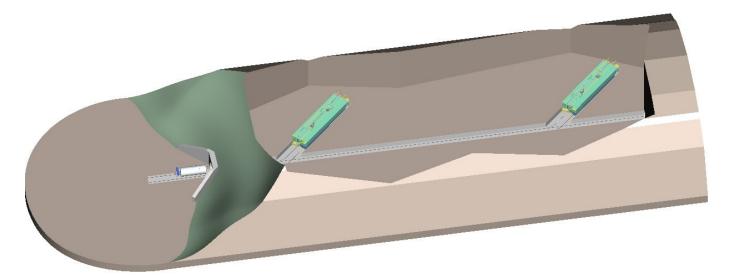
Theta13 facility concept showing detector rooms, cutaway view, tunnel length not to scale.
